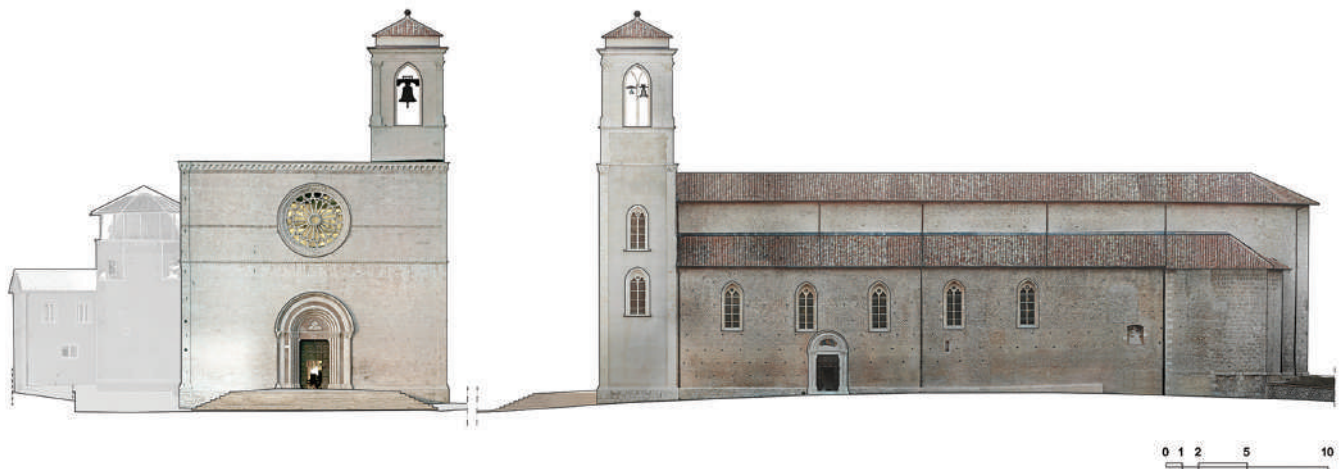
2D Orthophotoplans of the north and east elevations of the church.
